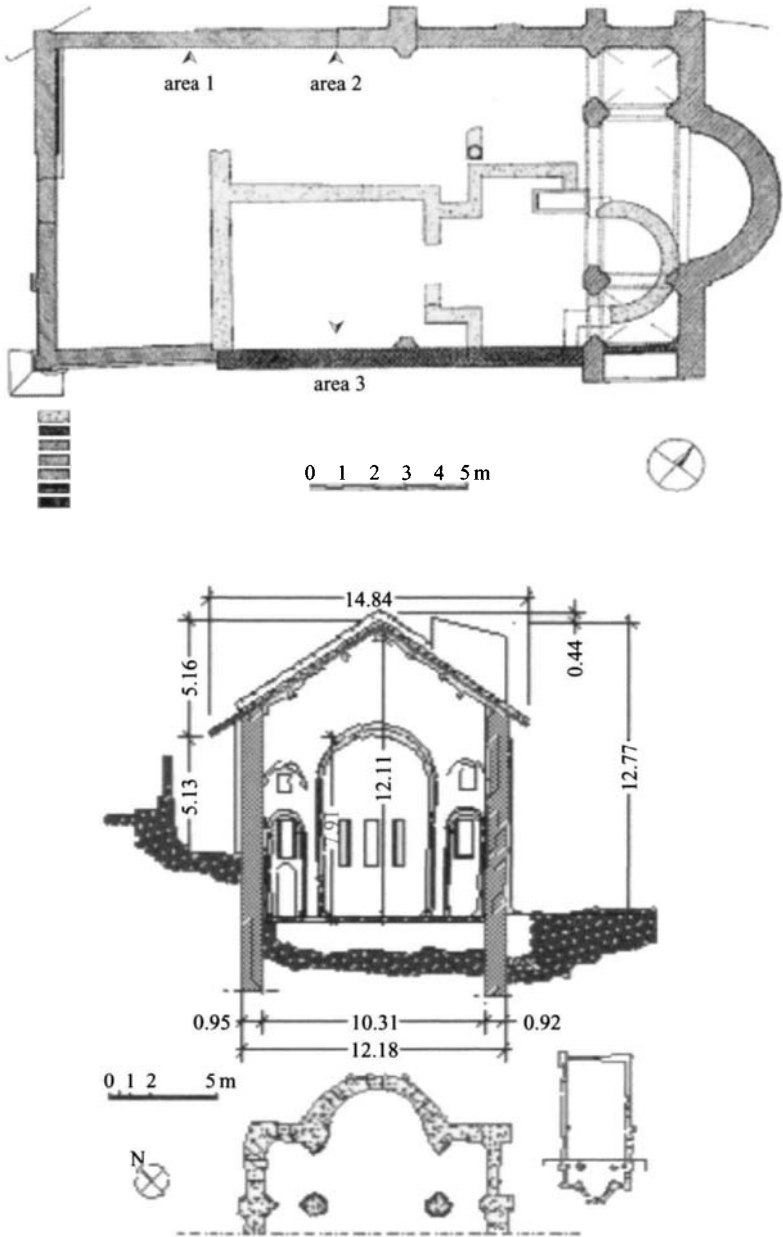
Plan view and section of the Church of S. Maria Rossa
